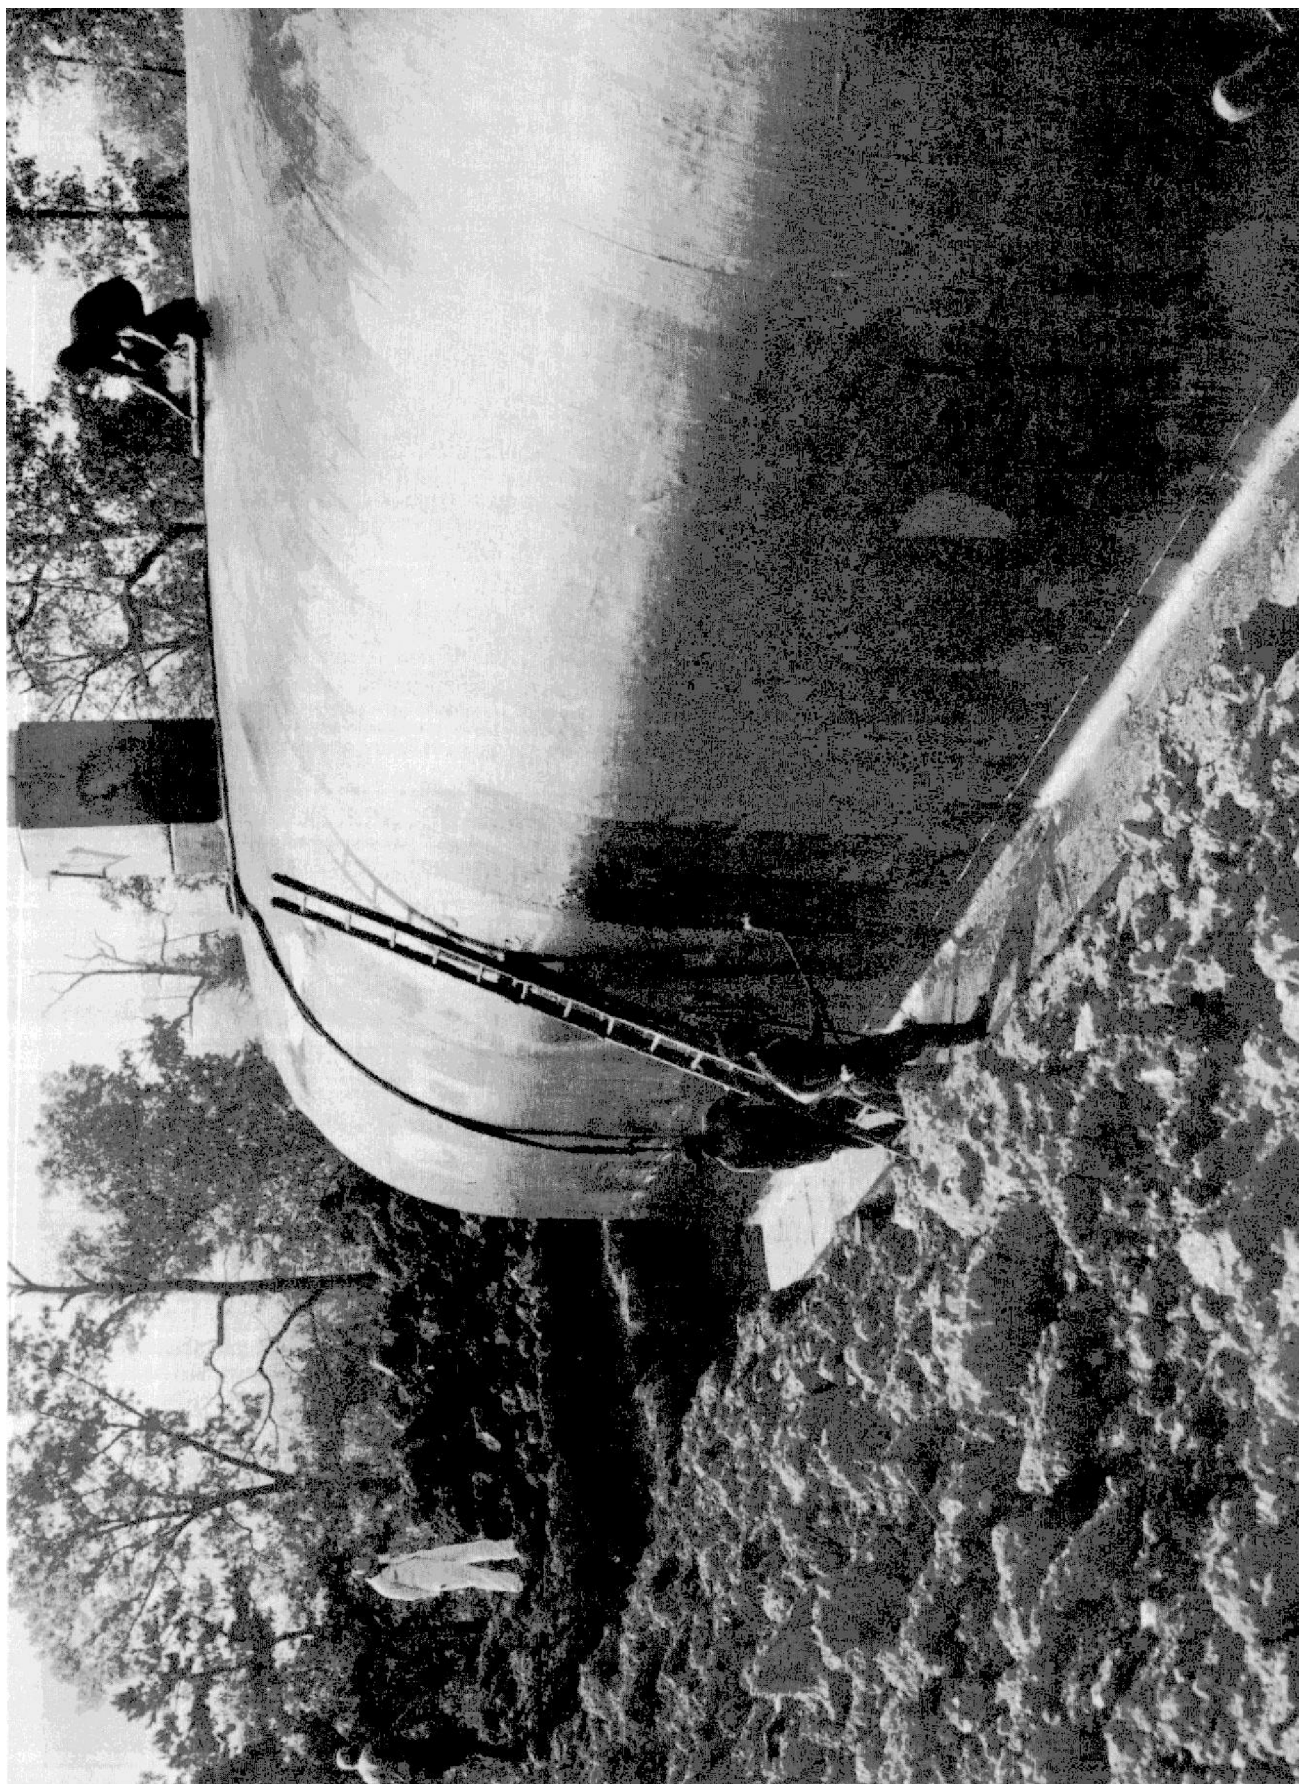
WATERPROOFING IGLOO—GLASS FABRIC.
